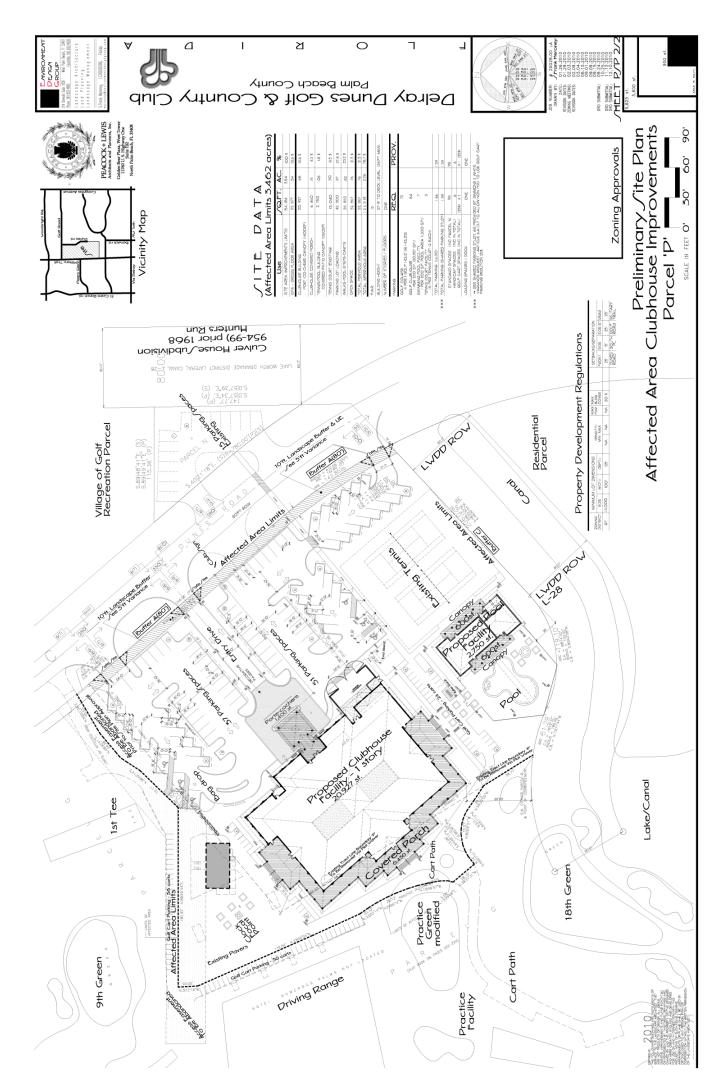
Preliminary Site Plan dated December 13, 2010 - Clubhouse
